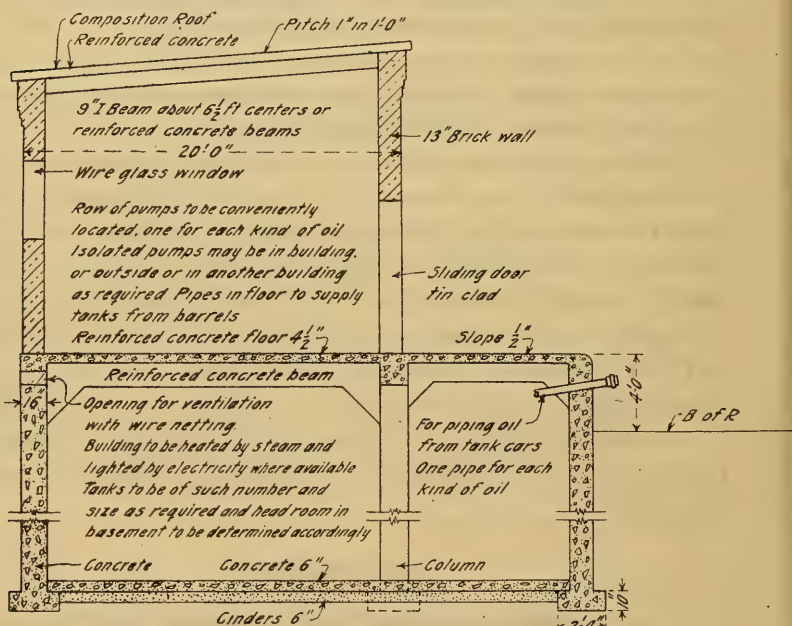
CROSS-SECTION OF TYPICAL OIL HOUSE, 20 BY 40 FEET.
